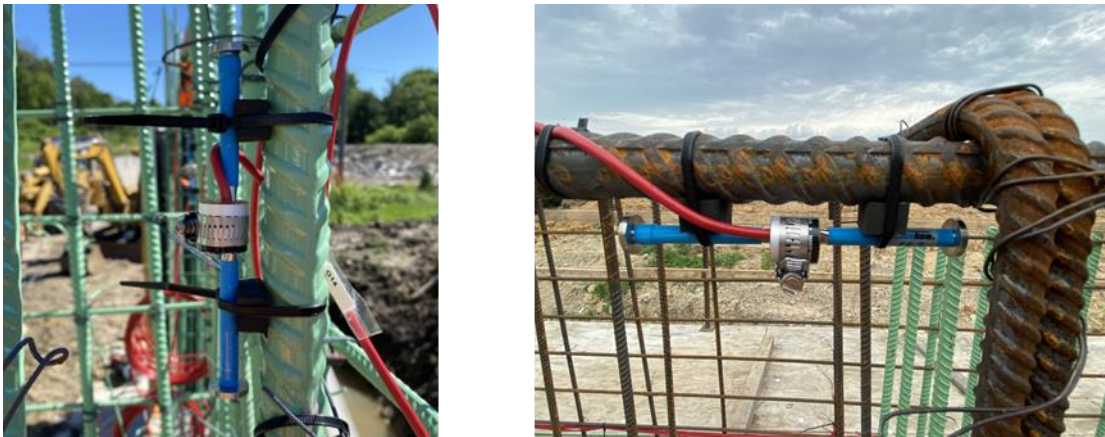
318 Scott bridge sensor layout for instrumented frame pier
